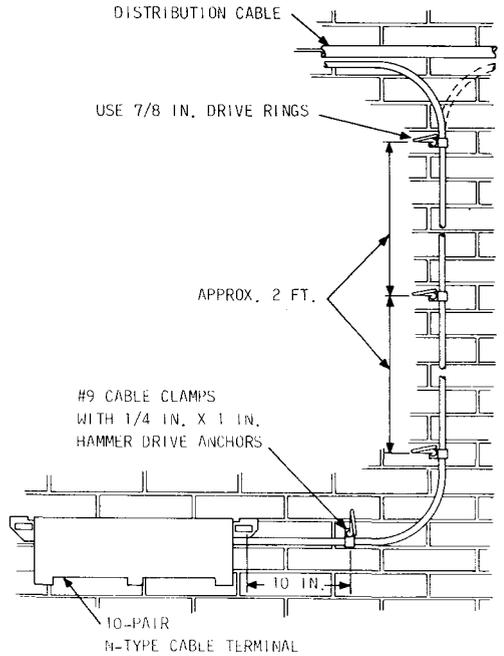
Horizontal-Mounted Terminal Below a Horizontal Cable Run
